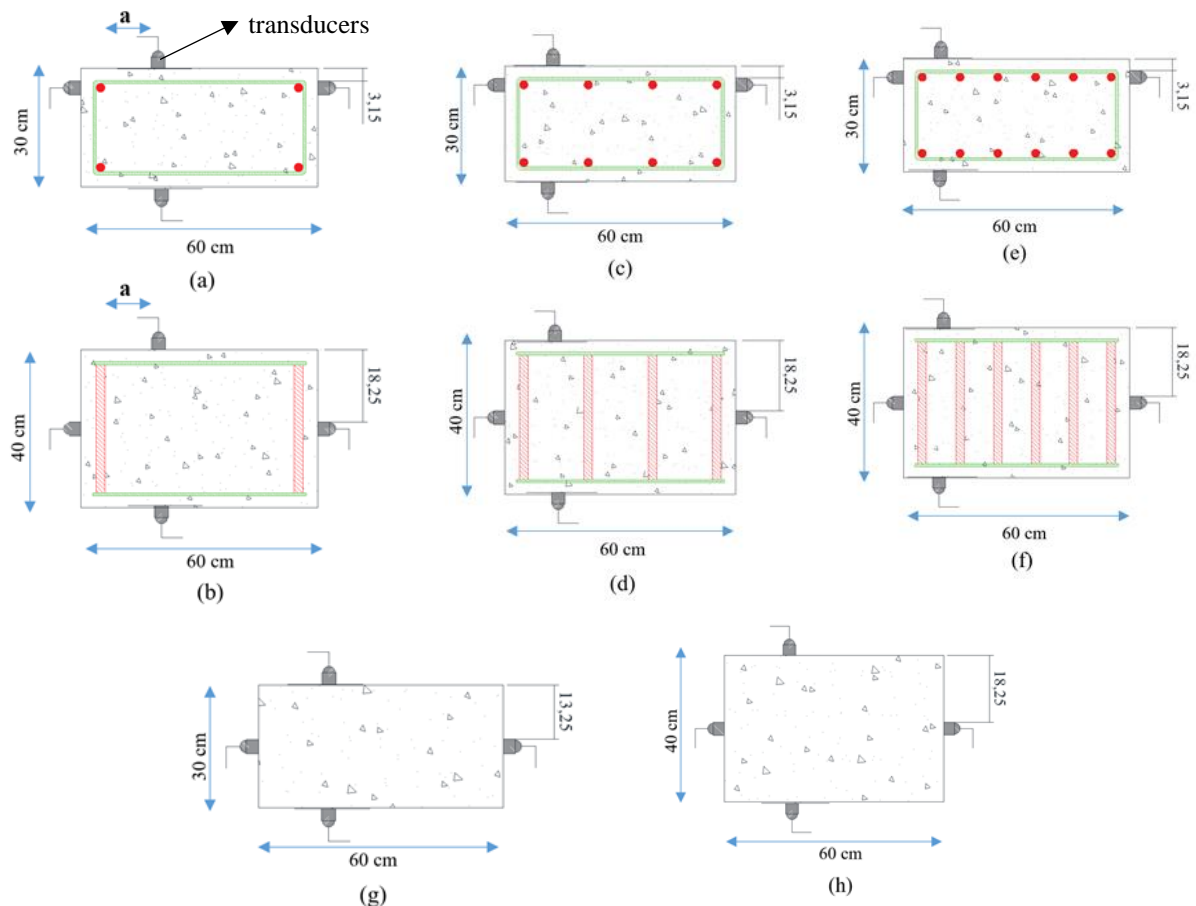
(a)-(f) Reinforced concrete; (g)-(h) unreinforced concrete
